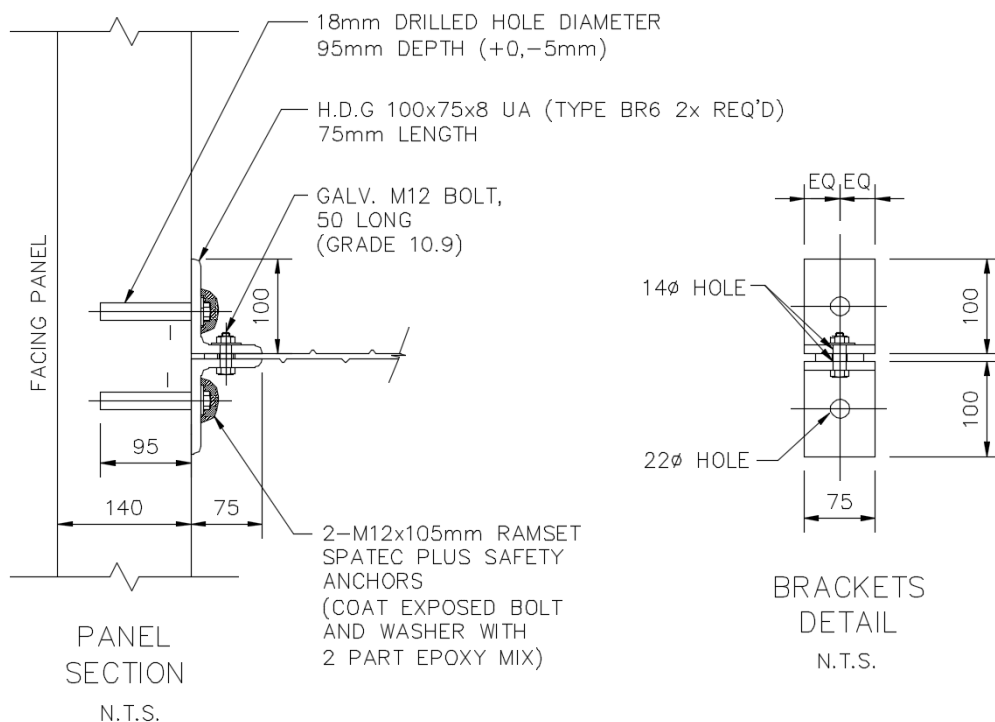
Panel Strengthening Detail – Additional Panel/RE strip connections
